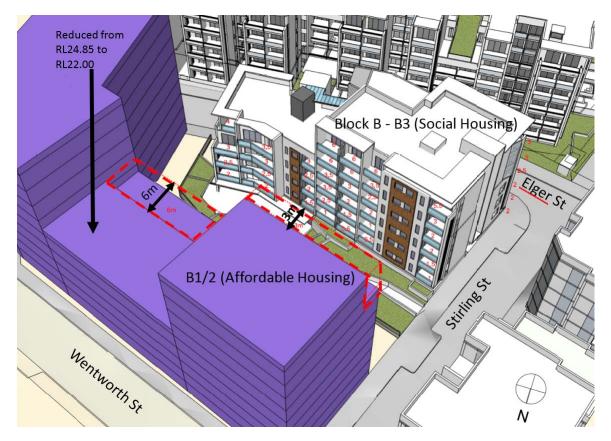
Aerial view generally looking south showing reduction to building envelopes for Buildings B1 and B2 (dashed lines)
